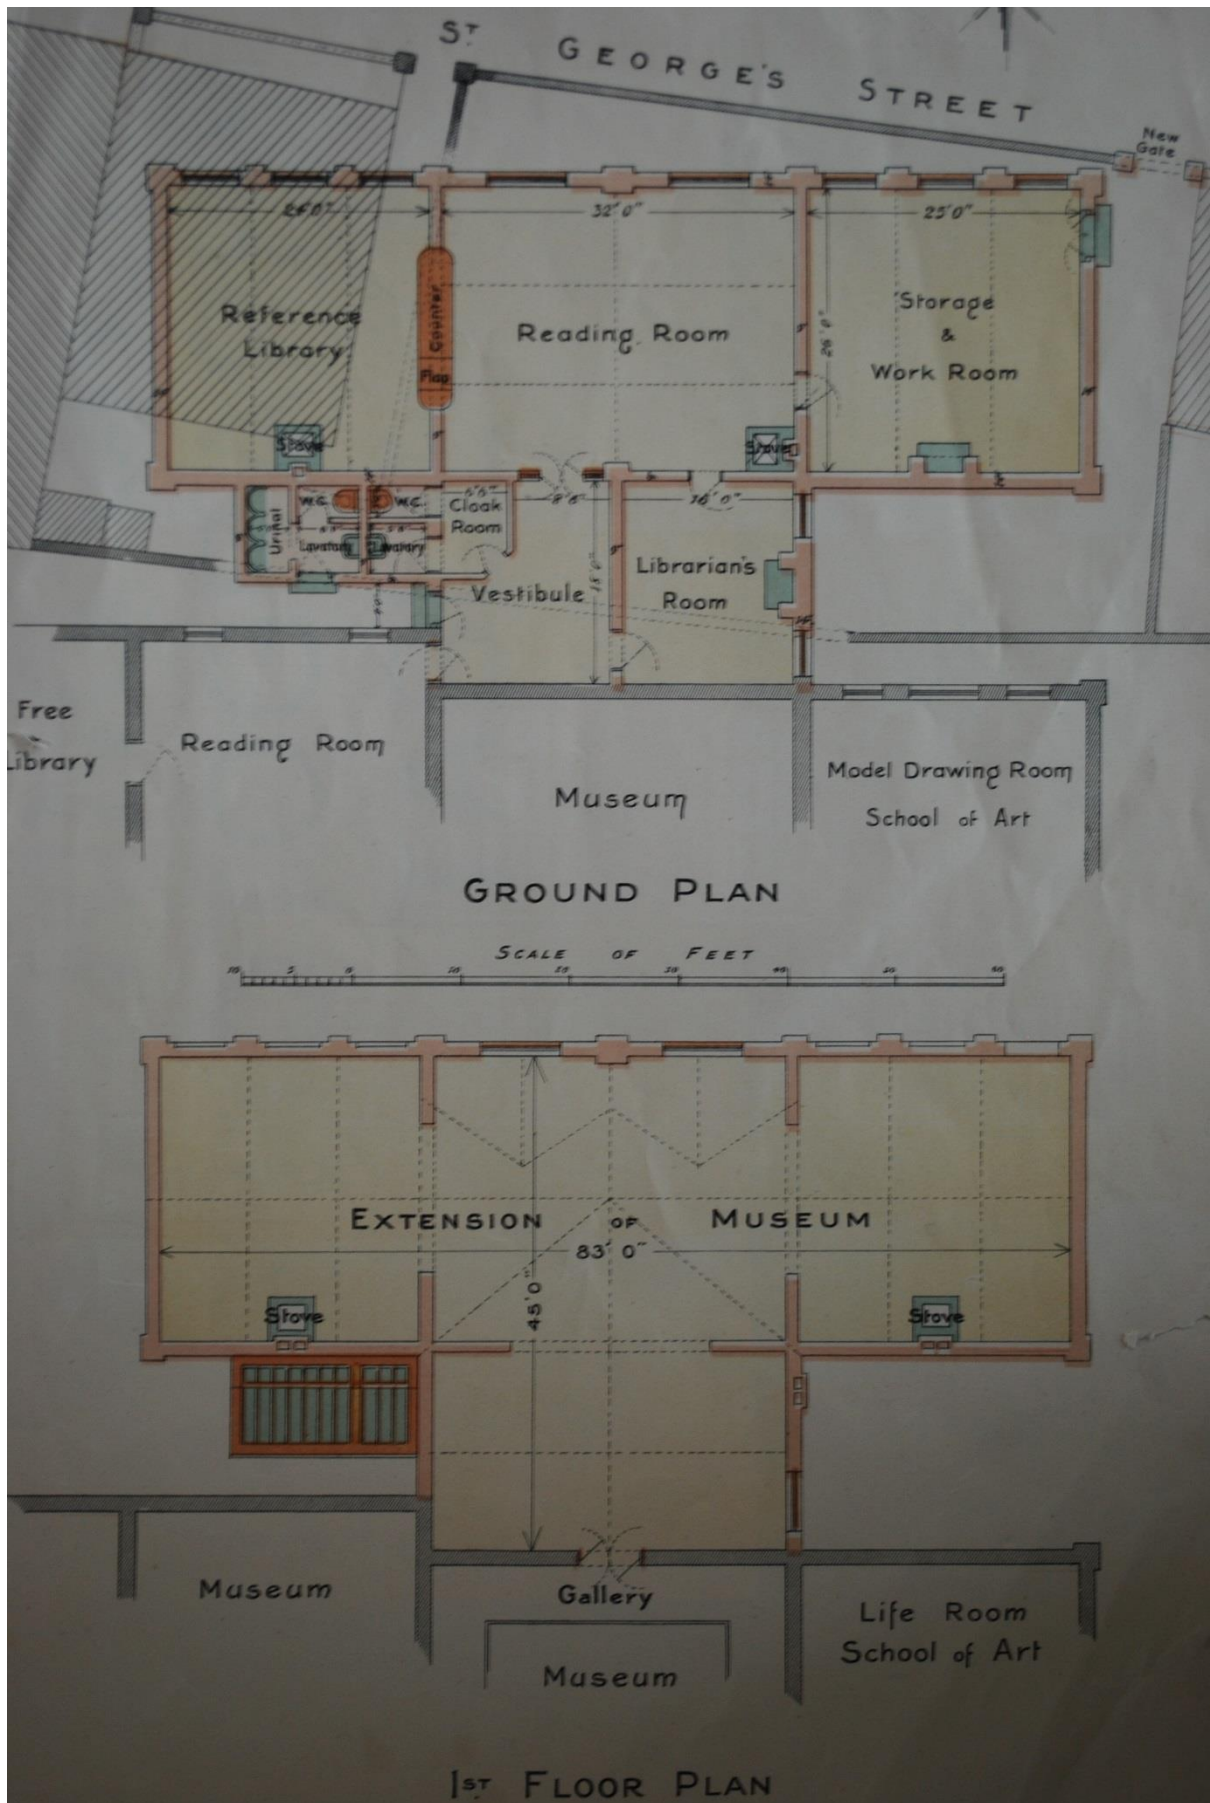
1900 extension (not executed as shown). Ground and first floor plans.
